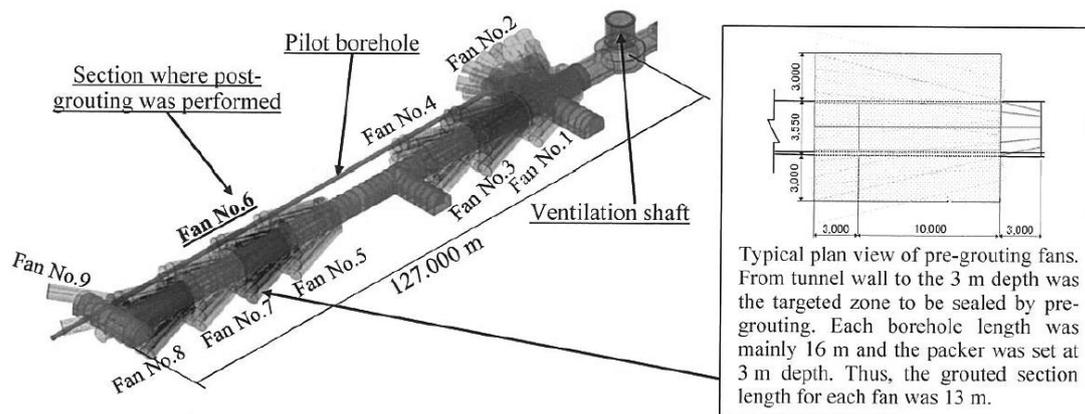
Schematic layout of pre-excavation grouting fans⁶⁾
